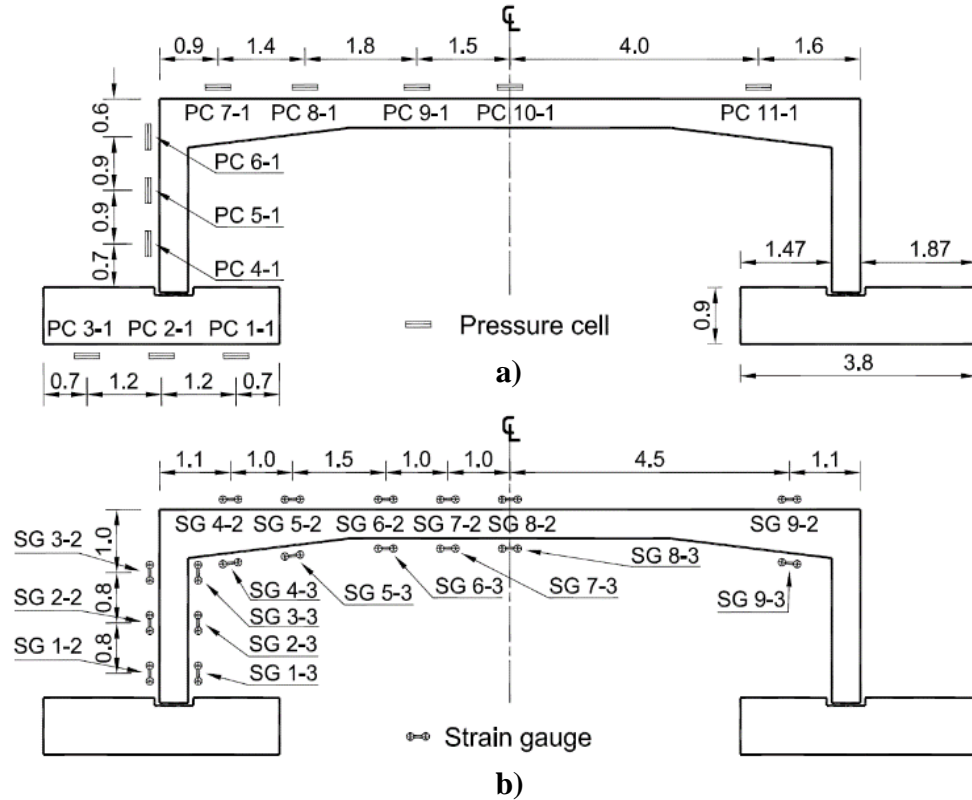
Pickering culvert instrumentation layout: a) pressure cells; and b) strain gauges. (All dimensions are in m)
